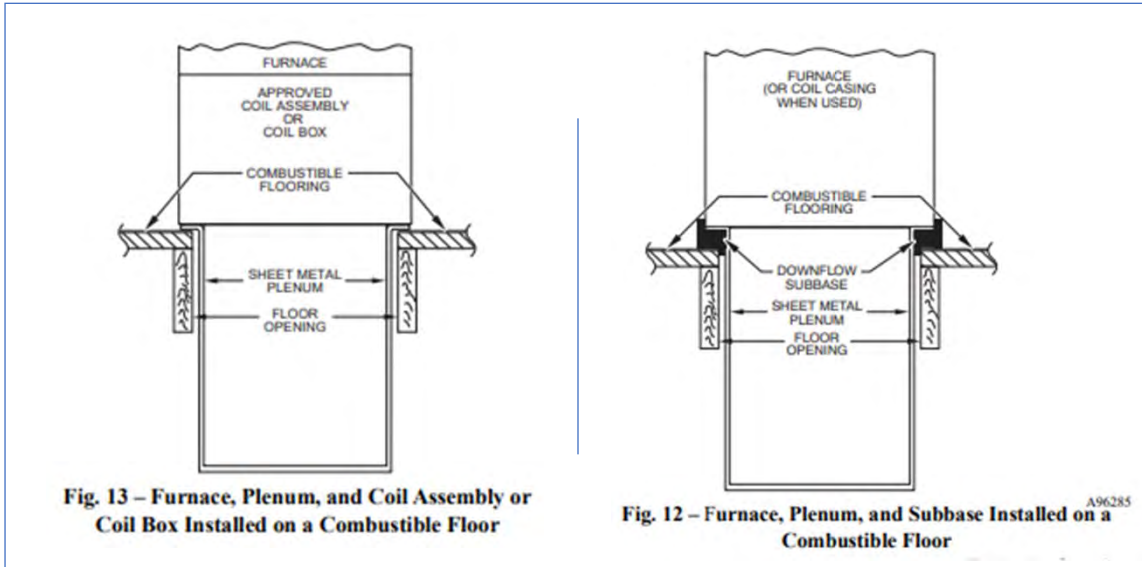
Furnace, Plenum, and Coil Assembly or Coil Box Installed on a Combustible Floor
